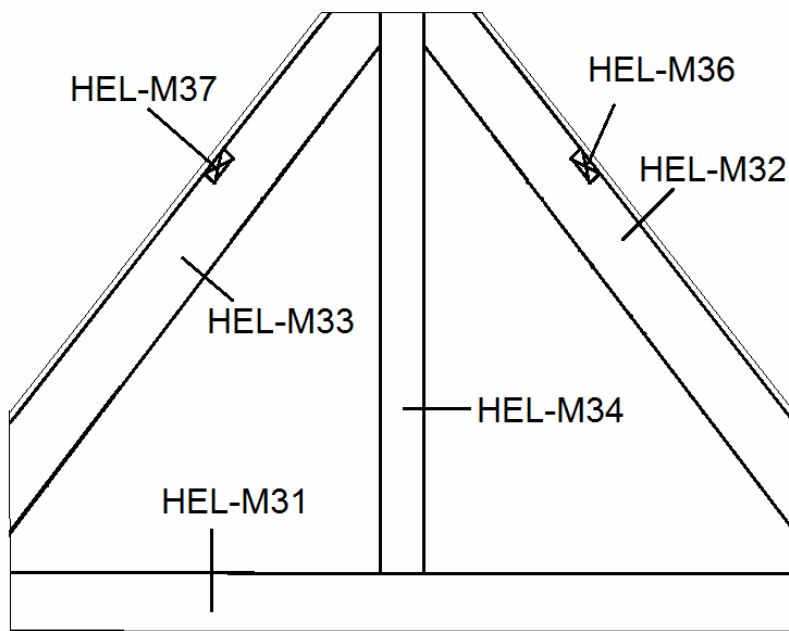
West wing, sketch of truss 2, showing the location of samples HEL-M31–4 and HEL-M36–7
